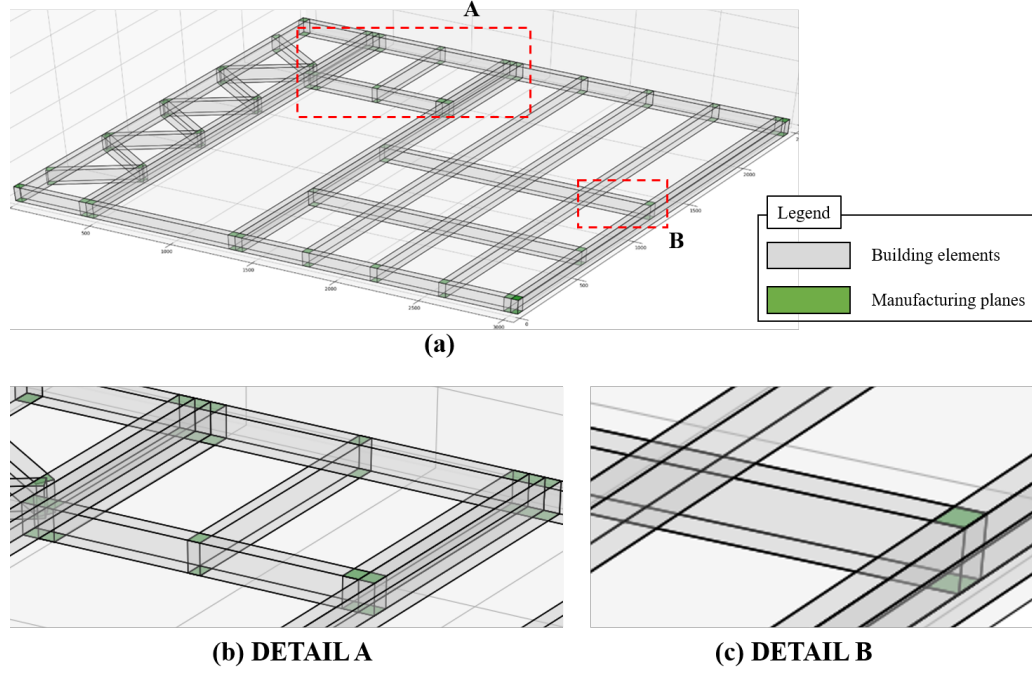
Simulated frame and manufacturing planes. (a) overview of simulated frame with manufacturing planes, (b) details of cripples, and (c) details of horizontal bracings.
